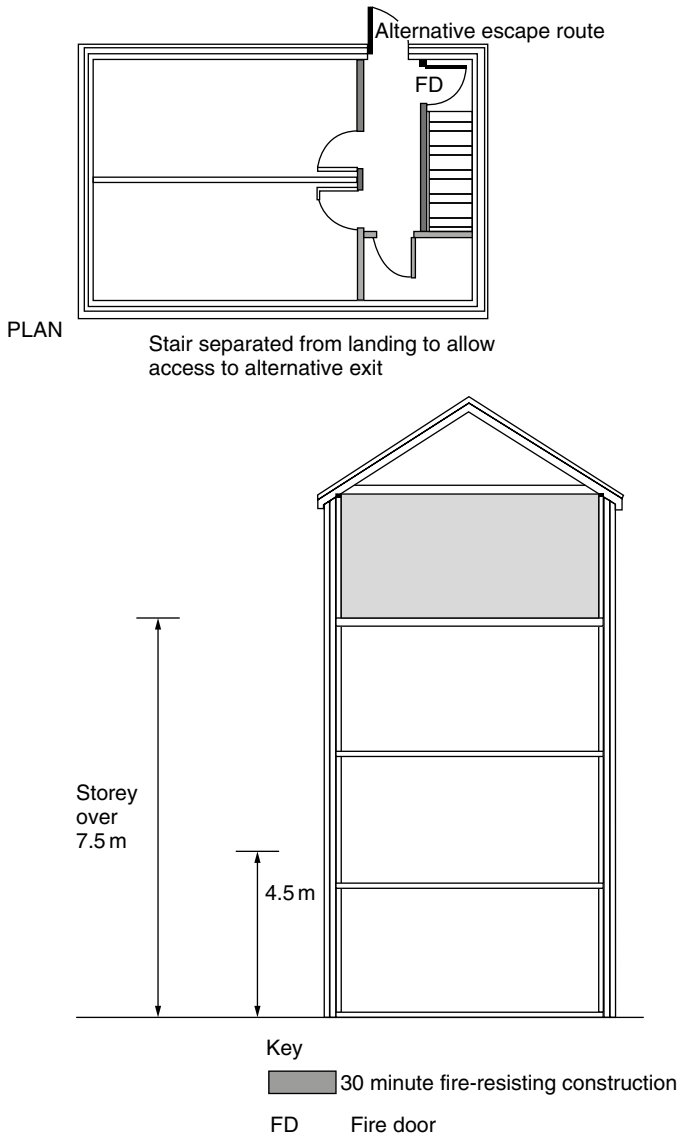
Fire separation in houses with more than one floor over 4.5 m above ground level.
